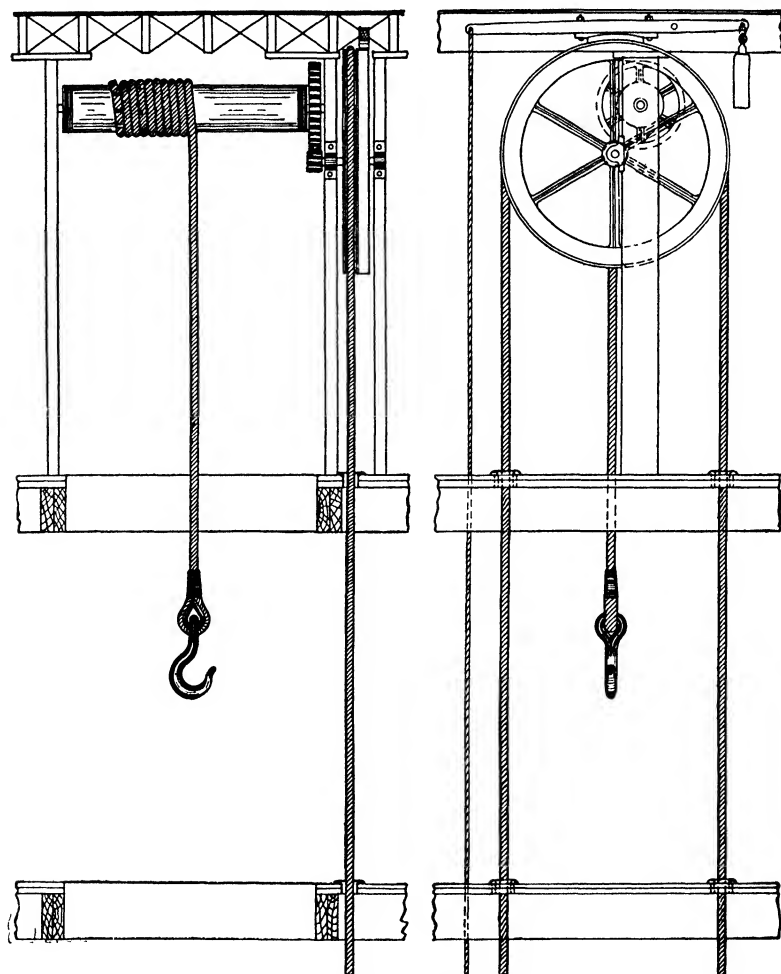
Front and Side Elevation of Sling Type of Hand Elevator
